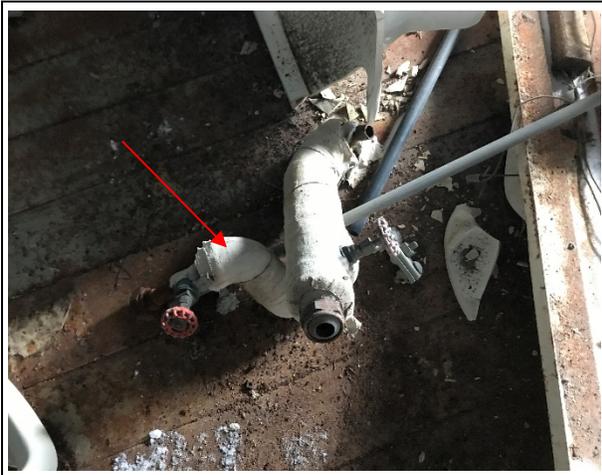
Building 1A – asbestos-containing (65% chrysotile) insulating cement on pipe fittings observed debris on floor
